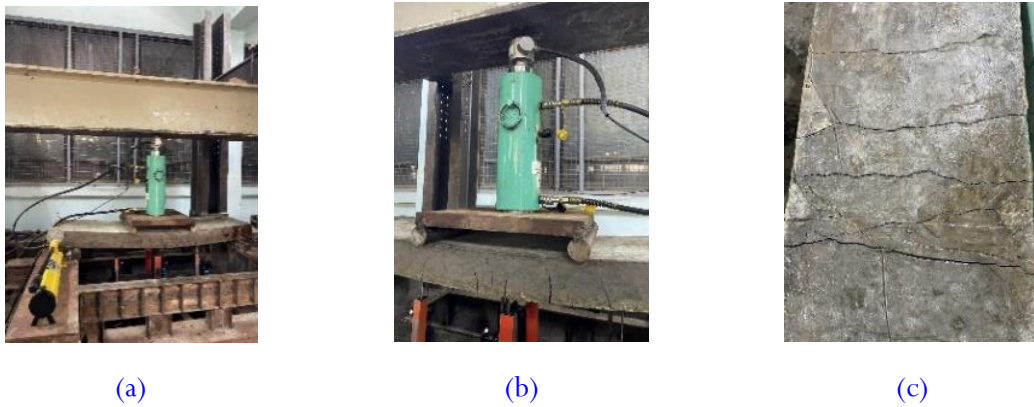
Flexural Strength Test of SFRC Slab at YTU Laboratory (a) Post-test setup of SFRC slab specimen, (b) Cracks pattern observed during testing, and (c) Cracks pattern observed after testing
